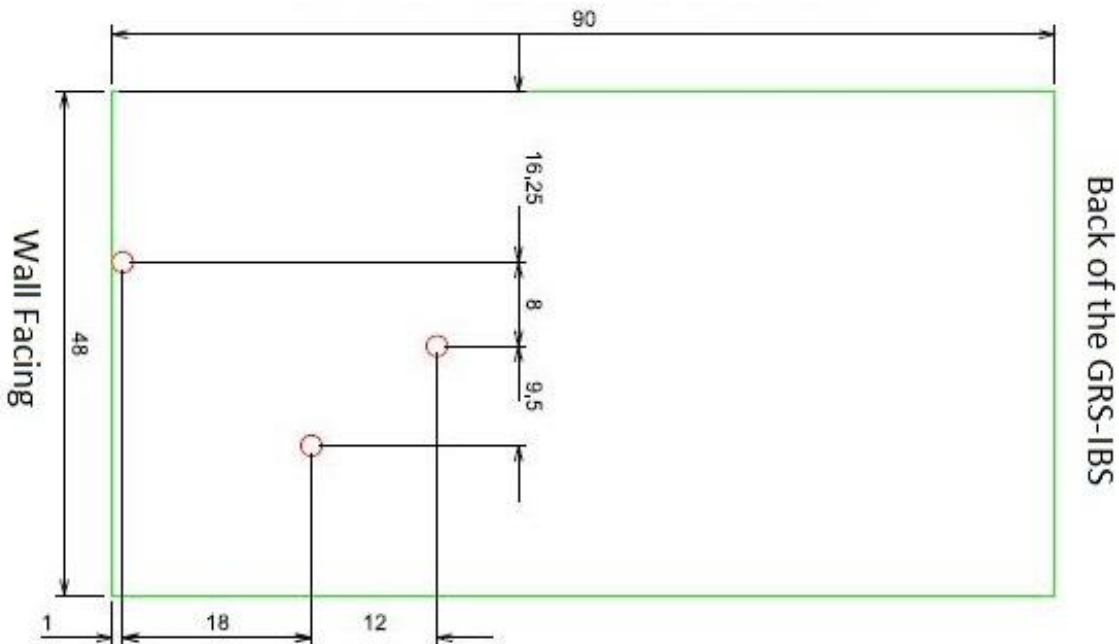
Plan view of WP connections to geotextile reinforcement at H = 27-inch above the foundation slab of GRS Abutment Models #1-#3 (dimensions are in inches)
